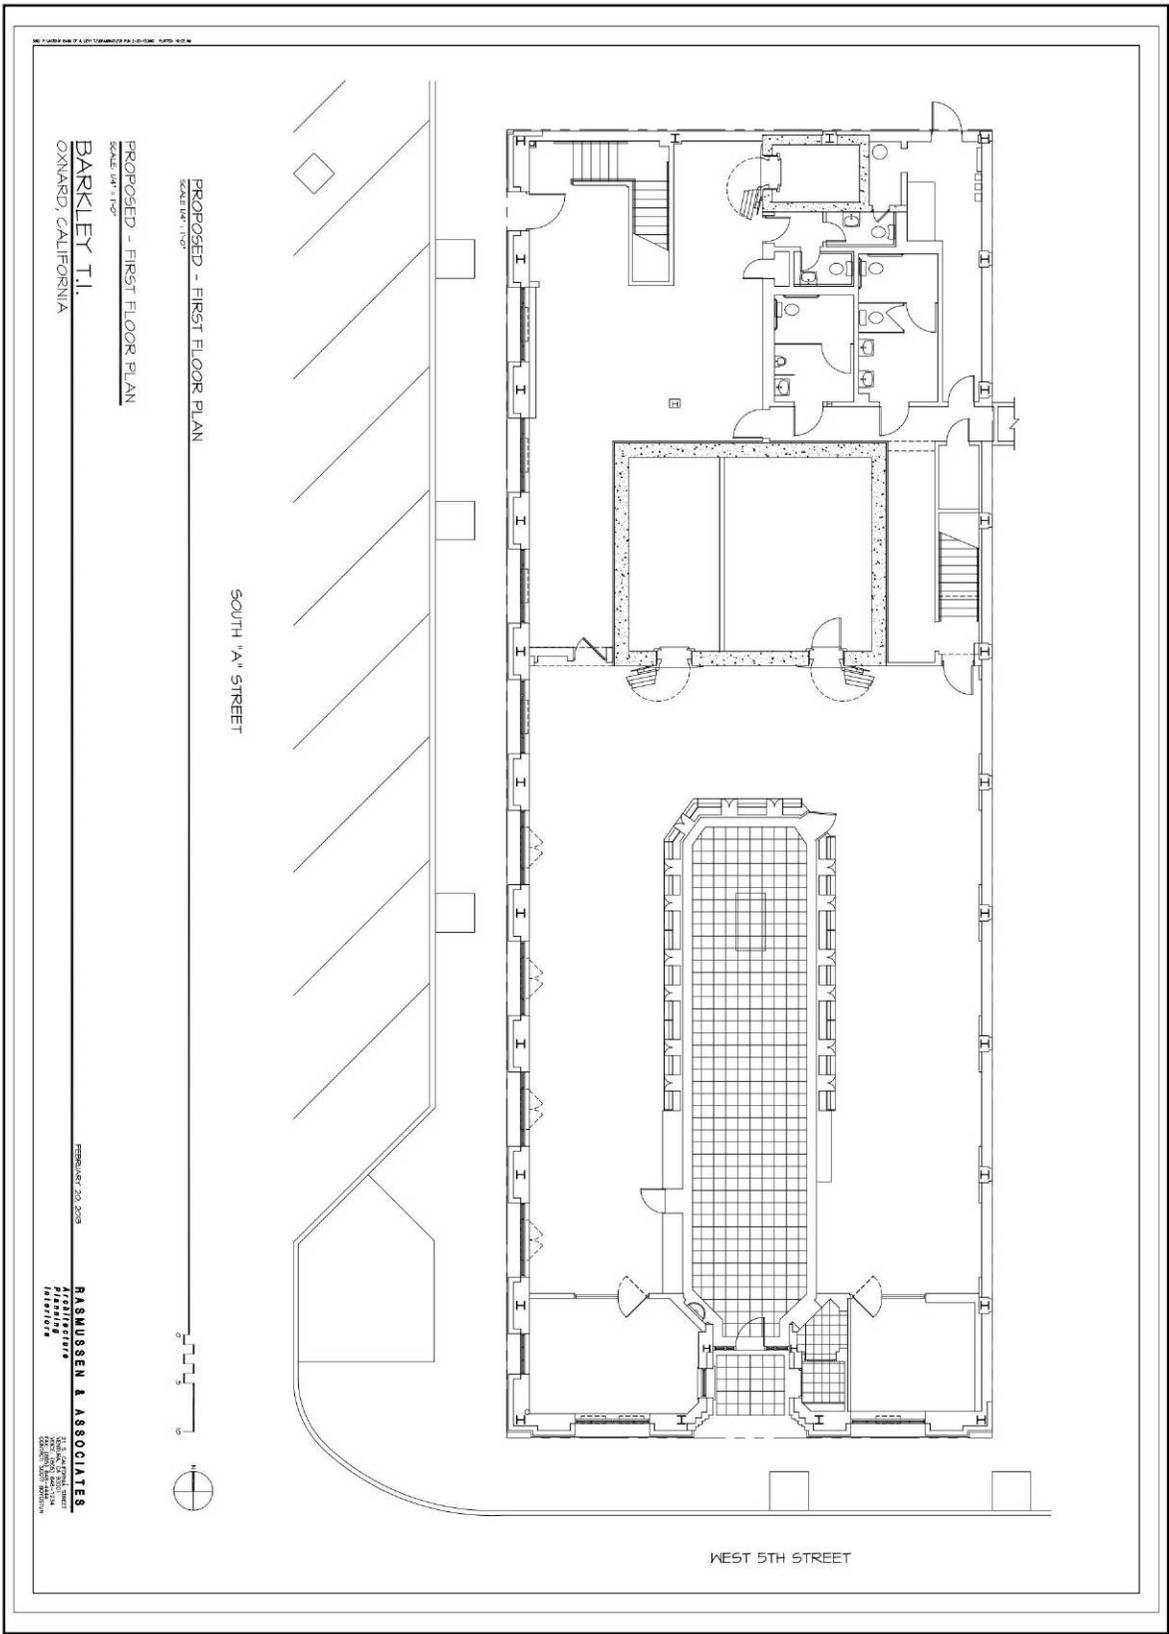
Proposed First Floor Plan [Source: Rasmussen & Associates]
